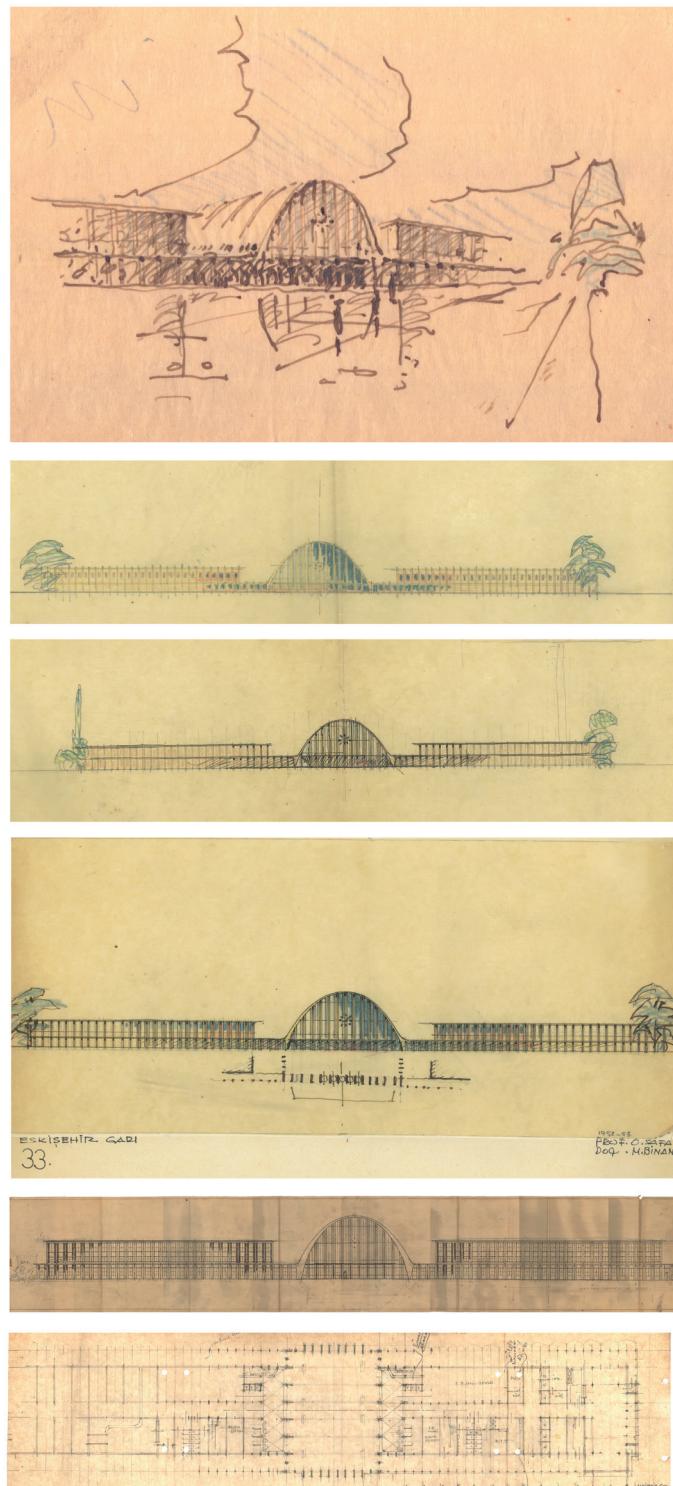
Final design of the Eskişehir Railway Station: sketch, façade and plan drawings (Binan, 1953).
